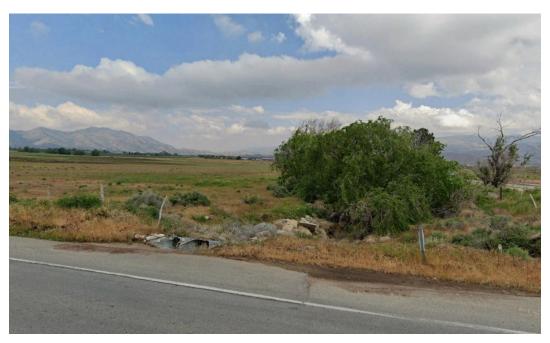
Drainage Inlet on the North side of Highline Road just west of the Tucker Road Intersection.
